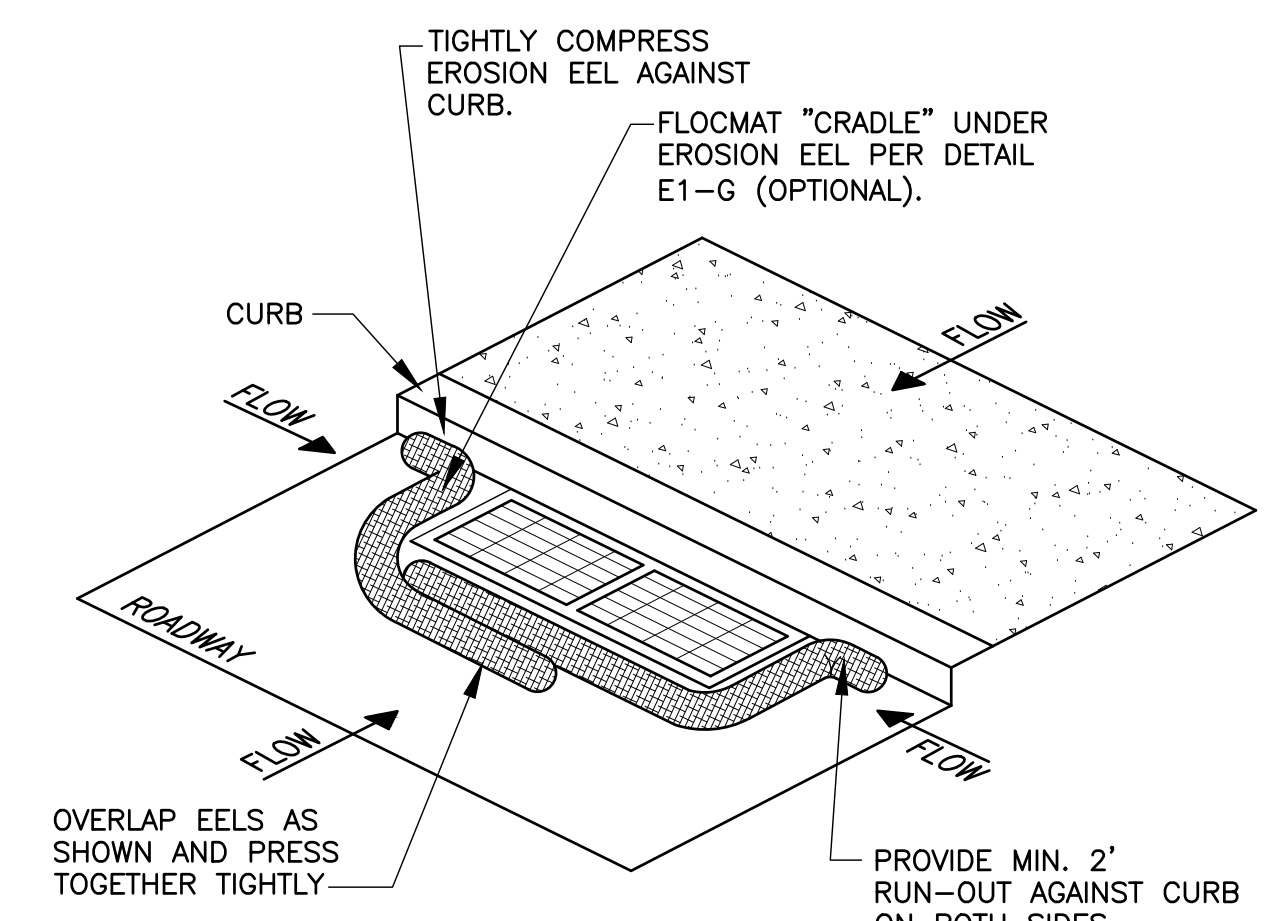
E: PLAN VIEW - LARGE CURB INLET (GUTTER EEL) N.T.S.
